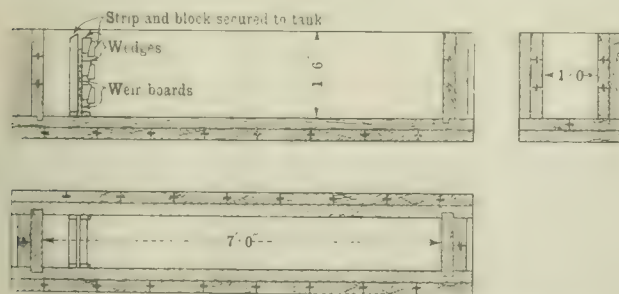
CONSTRUCTION OF WOODEN TANK FOR WATER LOAD.
